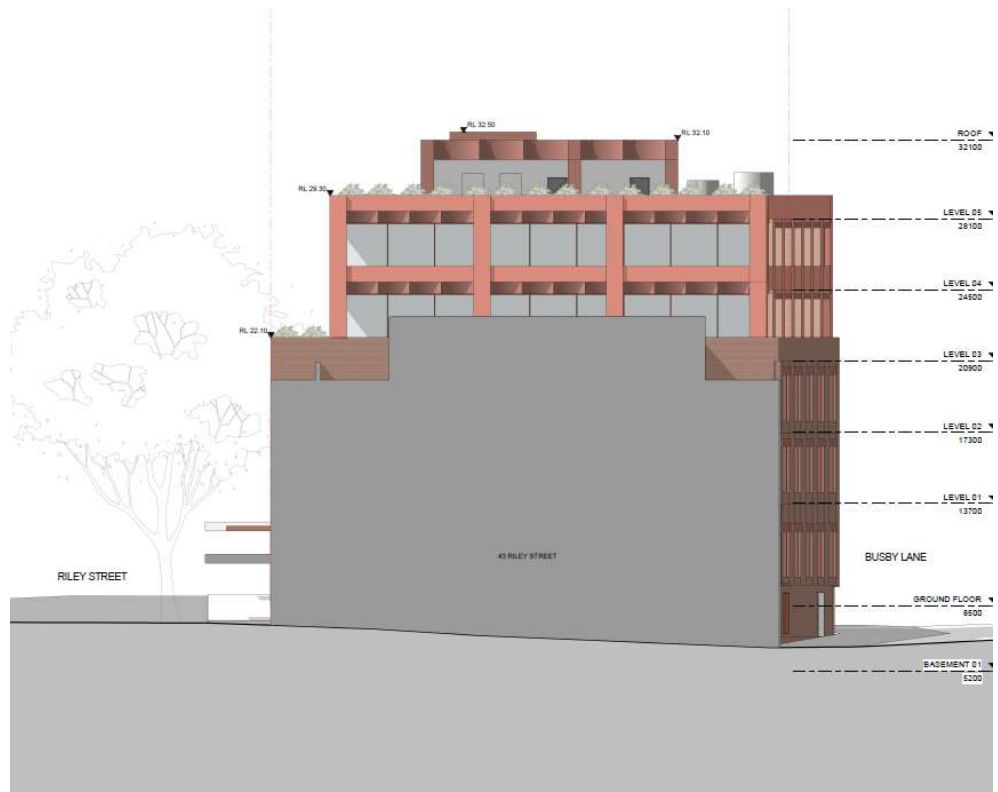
Northern elevation of a building form supported by the proposed building envelope. (Source: SJB)
